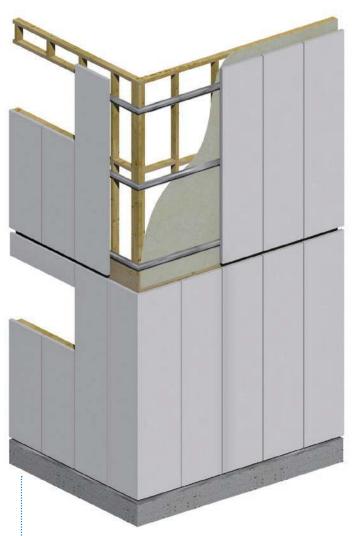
An example of an AAC cladding system: thin AAC panels fixed on a steel and timber frame with a layer of insulation in between [3].
